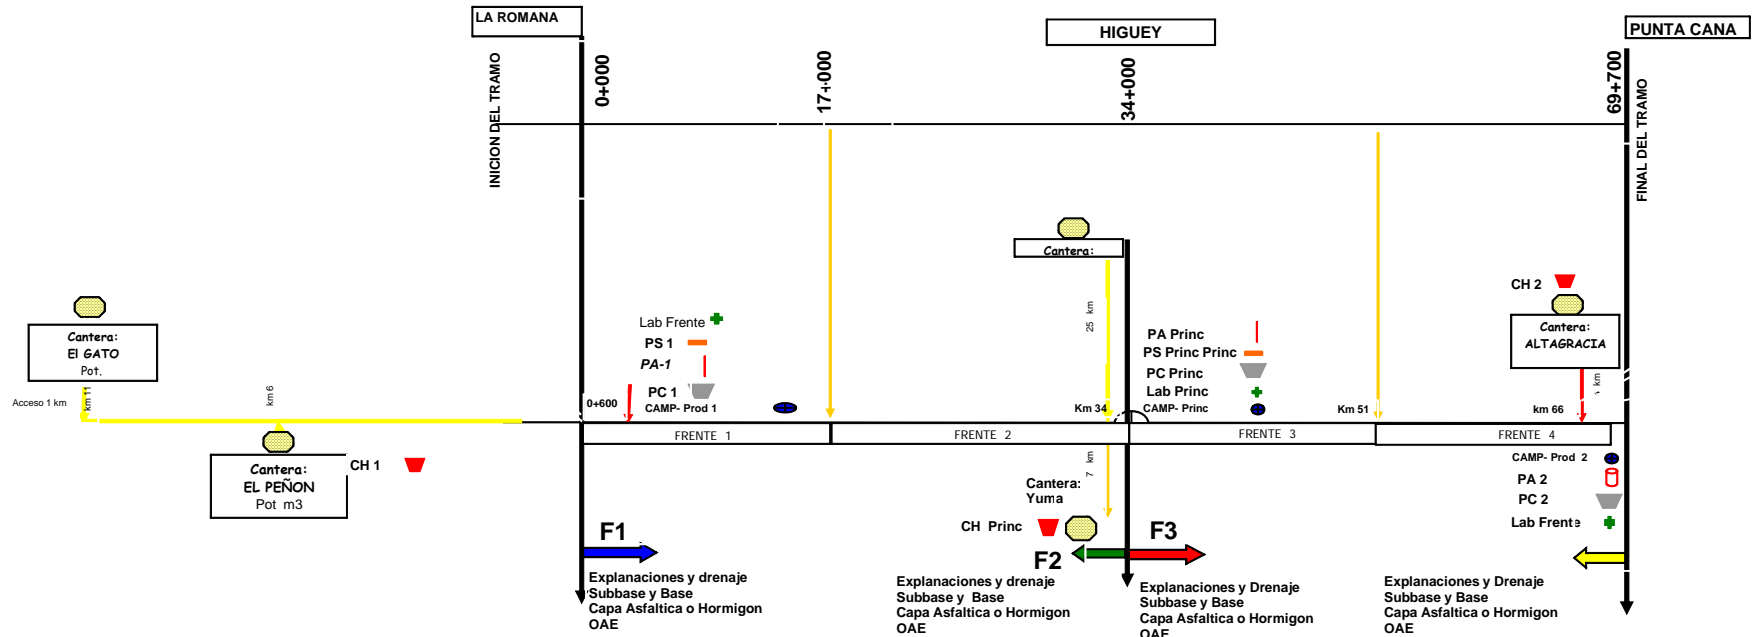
Work Front Plan for Autopista del Coral Construction
